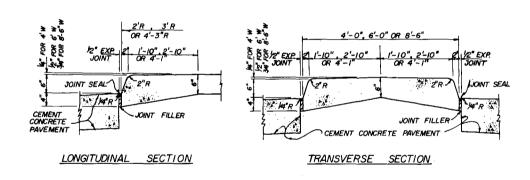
DETAILS OF TYPE I CONCRETE TRAFFIC SEPARATOR
